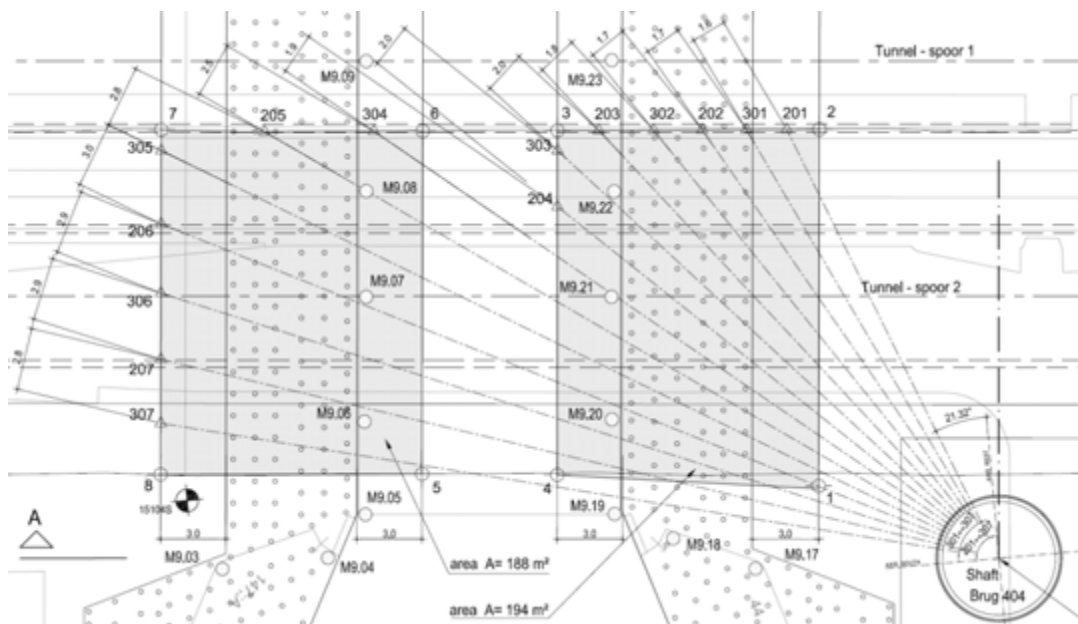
Plan layout of upper injection pipes for the shallow East tunnel
